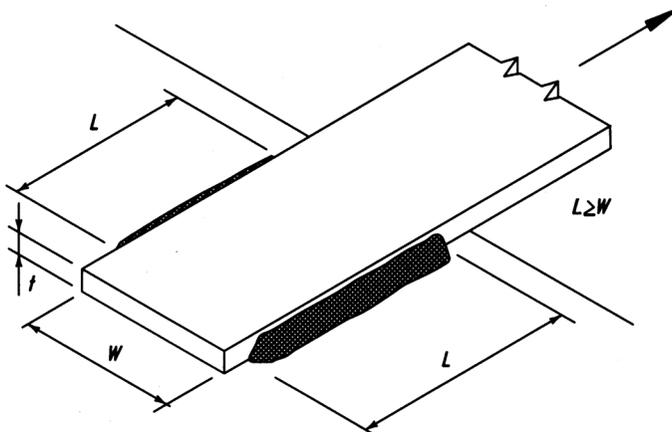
Longitudinal fillet welds.
